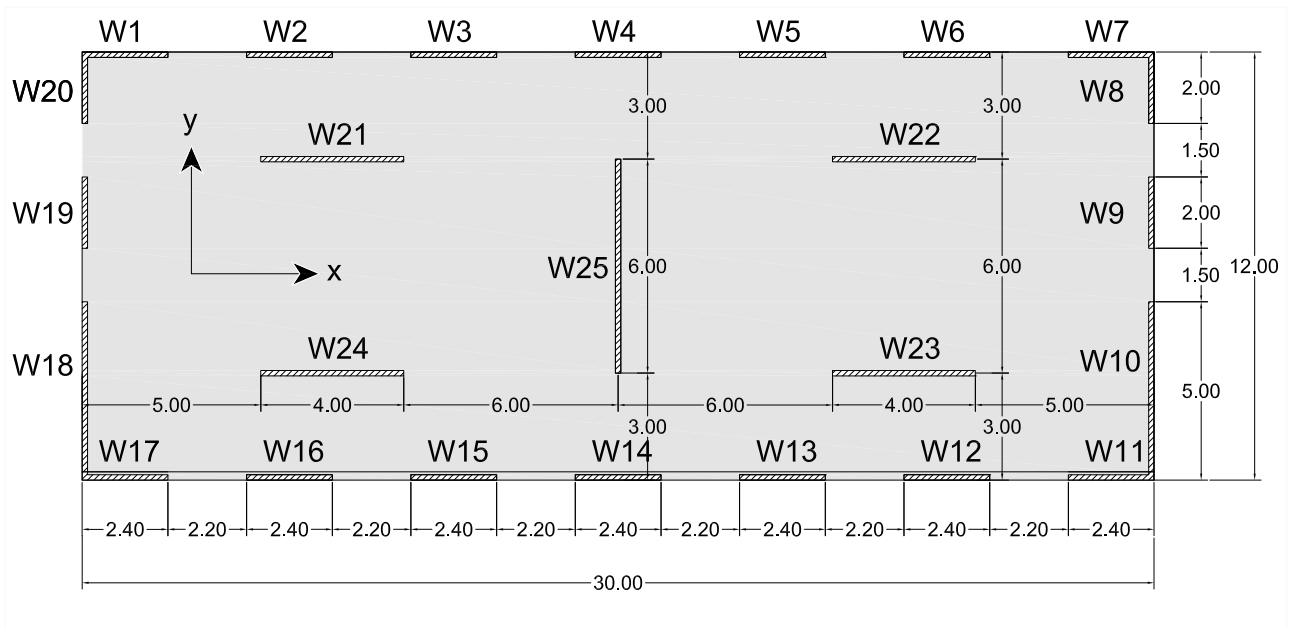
Example building: Plan view, all dimensions in m. Thickness of all walls: 0.15 m (adapted from [32])
